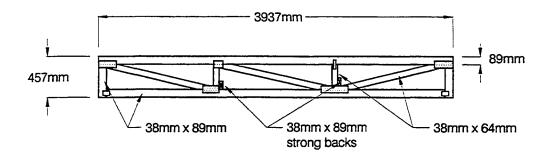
Construction of 457 mm deep wood trusses using 38 x 89 mm lumber.
